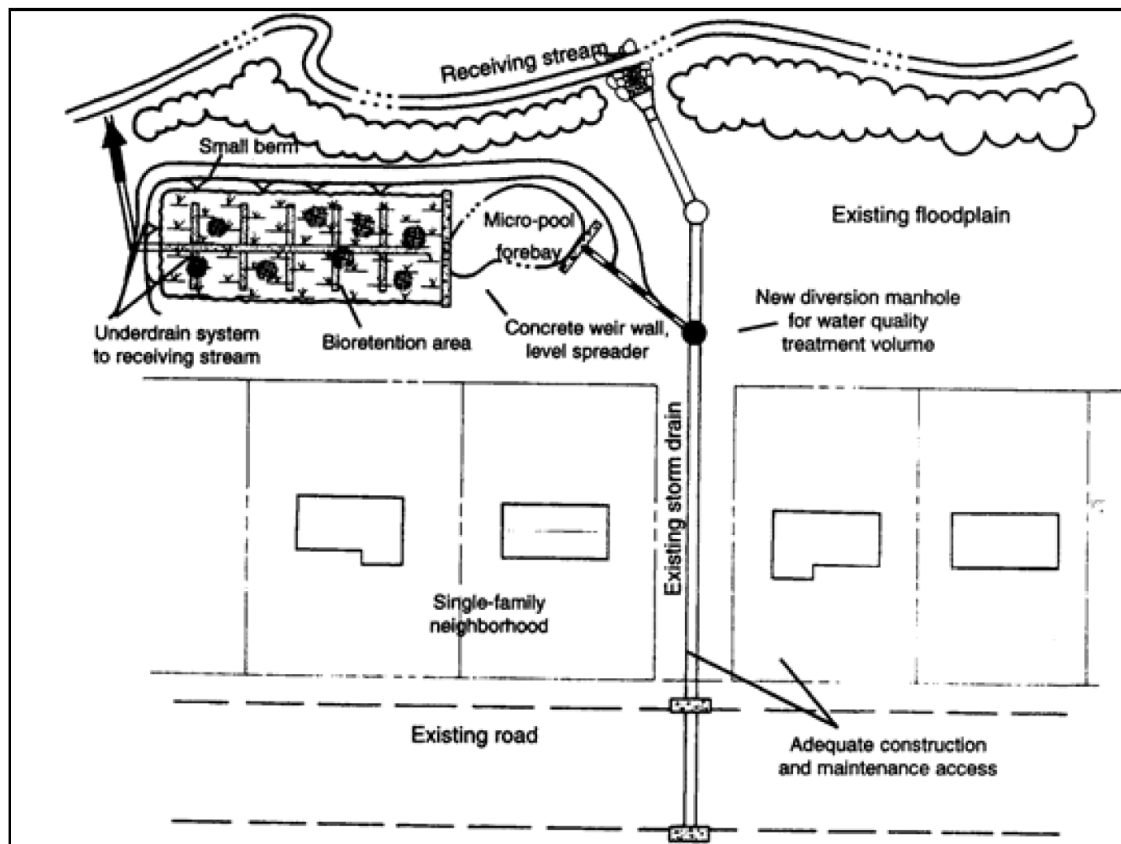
Pipe Outfall Retrofit (Source: Schueler et al. 2000)
